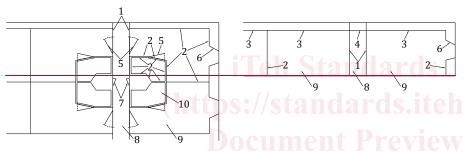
Construction details of "B" class fire-resistant compartment systems — Type I construction
